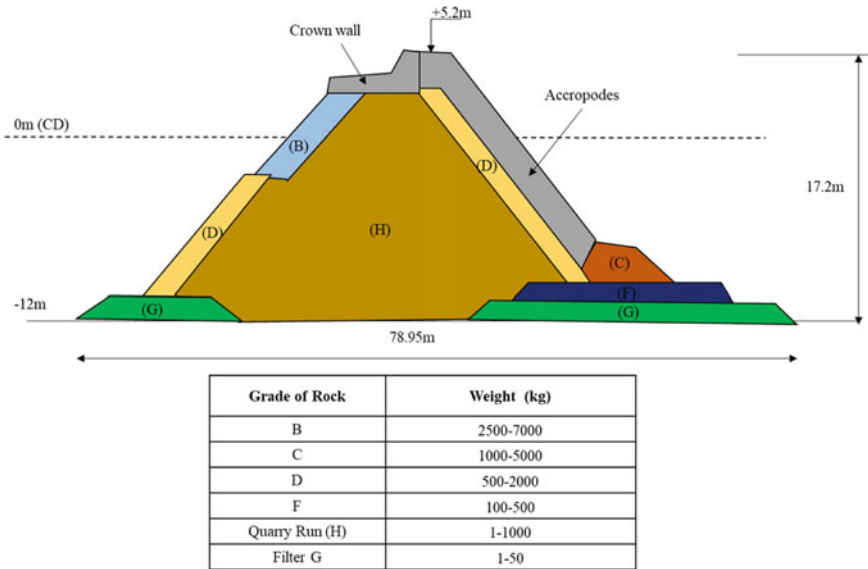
Sectional details of the north breakwater at Ennore port
